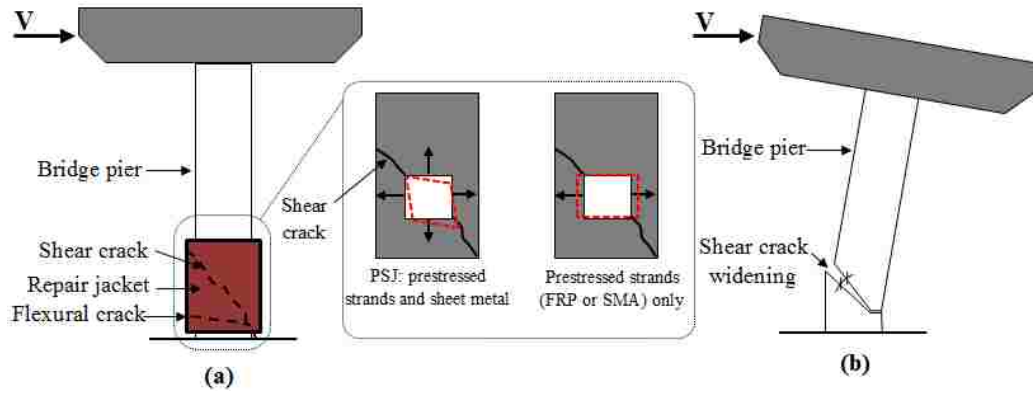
Shear crack arrest mechanism and bridge pier collapse: (a) bidirectional versus unidirectional restraints on crack opening, and (b) potential pier collapse due to continuous crack widening under aftershocks.
